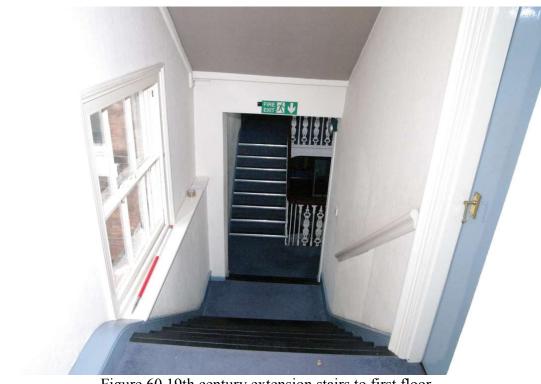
19th century extension stairs to first floor Looking north. Toilets on right. 1m scale
